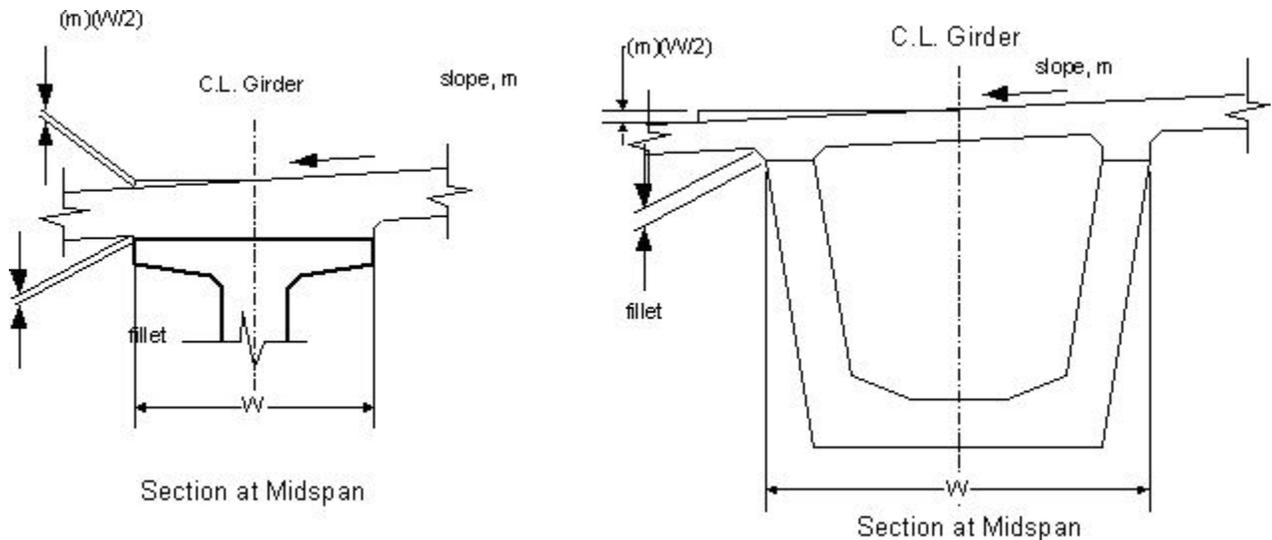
Wide Flange and Trapezoidal Tubs Girder Orientation
